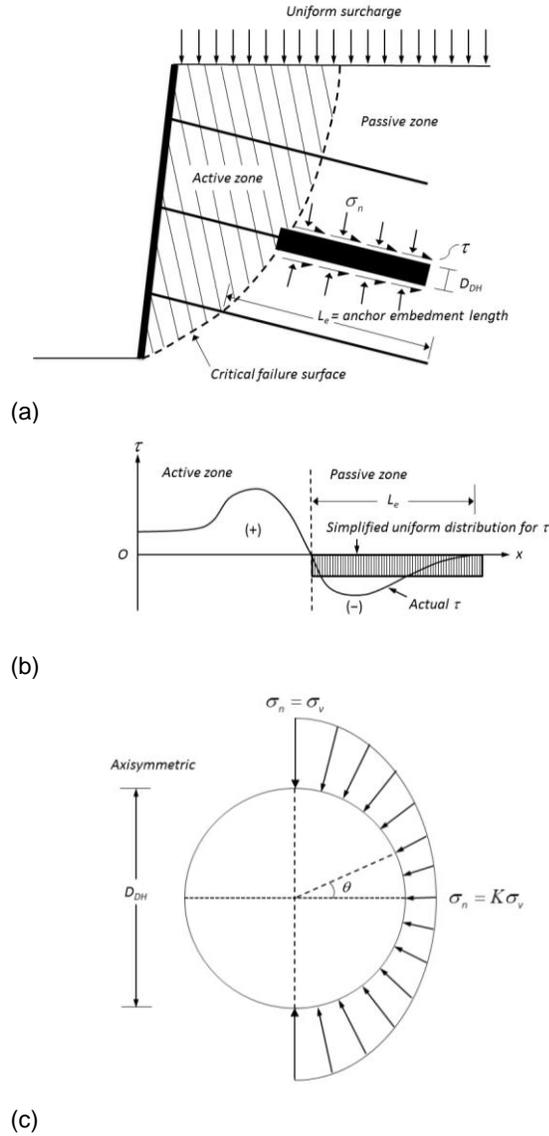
Nail pullout limit state: (a) soil nail wall; (b) shear stress along a soil nail; (c) cross-sectional view showing normal stress acting on grouted soil nail
